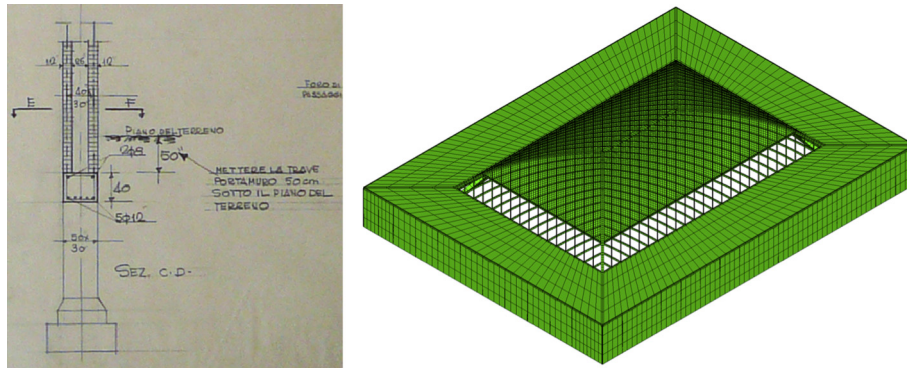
The original scheme showing a section of an infill wall, reporting its dimensions, together with the pillars' foundation (a) [41]. A 3D view of the global finite element model of the hall (FEM1) showing its FE mesh (b) [43].
